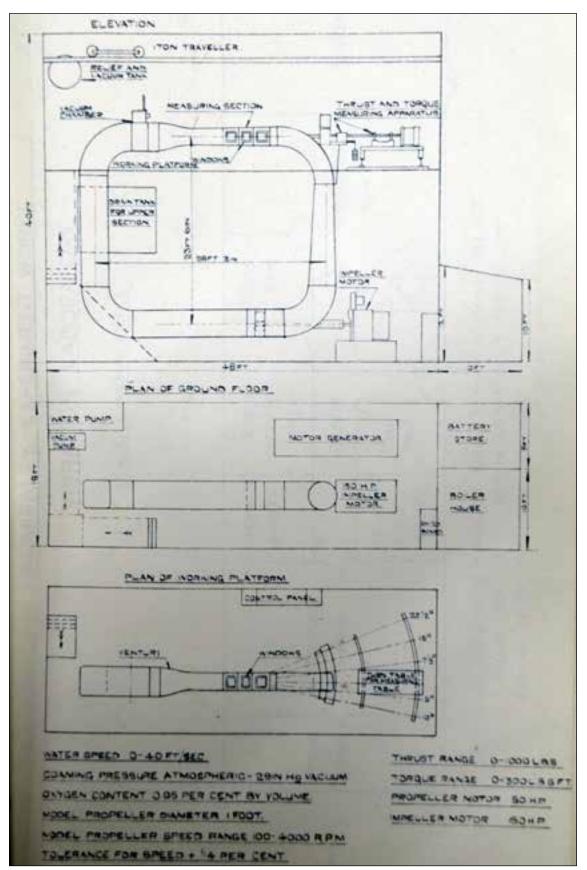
Plan and elevation drawings of No 1 Cavitation Tunnel (TNA ADM 226/644)
